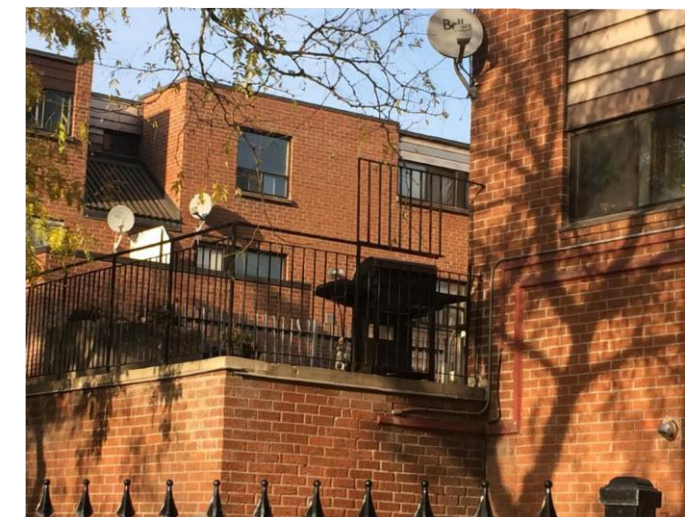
Existing brick cladding at Swansea Mews. Image from Toronto Star.
